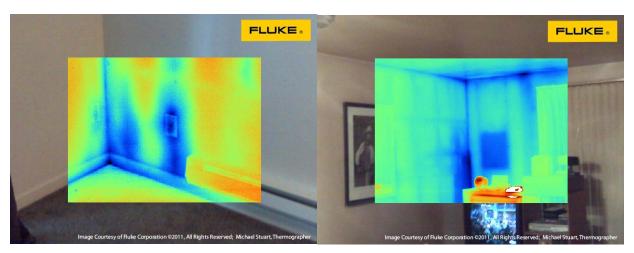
Air infiltration surrounding an electrical outlet (left); thermal bridging and air bypasses in walls and ceiling (right)
